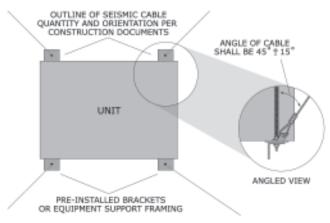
Plan view of vibration isolation suspended attachment to the building structure.
